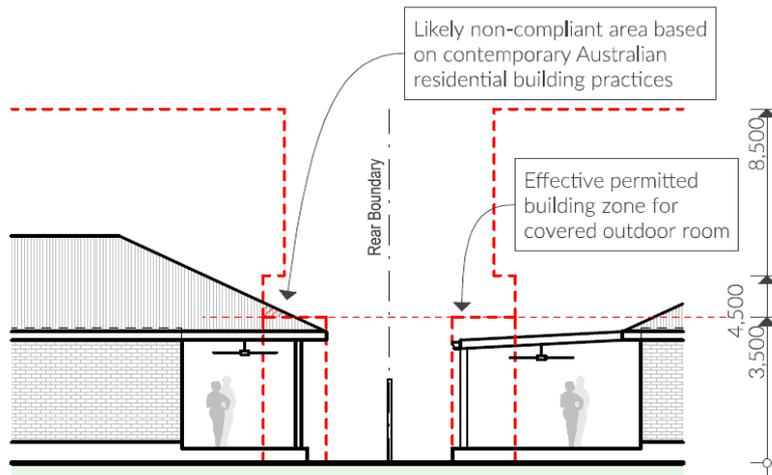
Perverse outcome of 3.5m height restriction for 'covered outdoor room'
